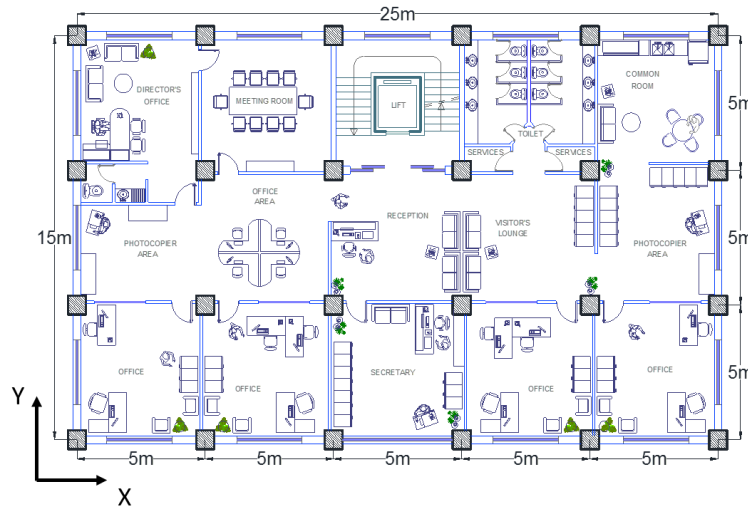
Architectural drawing of the floor-type plan of the benchmark building.
